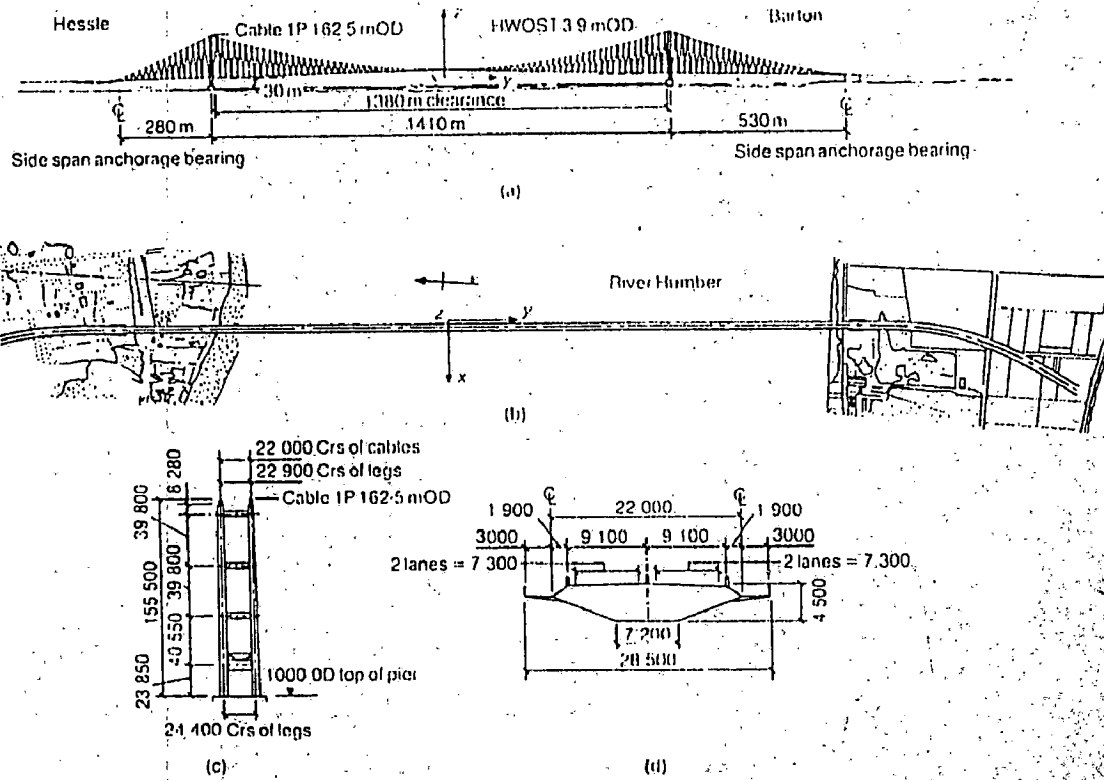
Humber Bridge general arrangement: (a) elevation; (b) plan; (c) elevation of towers; (d) section through deck
